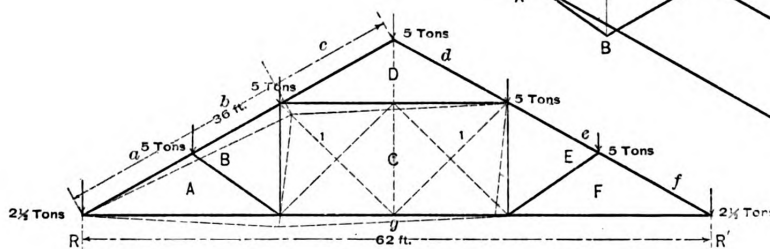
Skeleton of Truss.—Scale, 1-16 Inch to the Foot.
